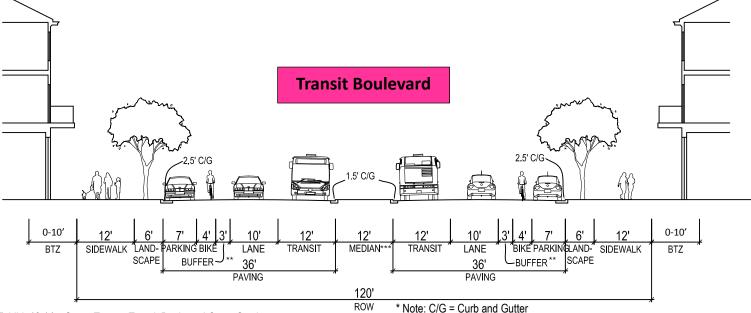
Street Type 5: Transit Boulevard Cross Section
